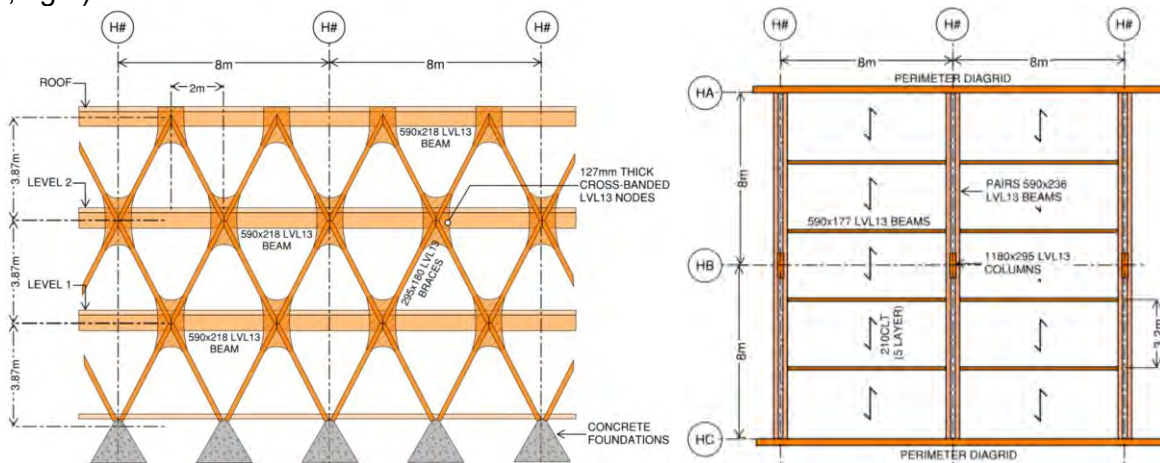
(Left) Diaphragm, (Right) Typical superstructure bay
